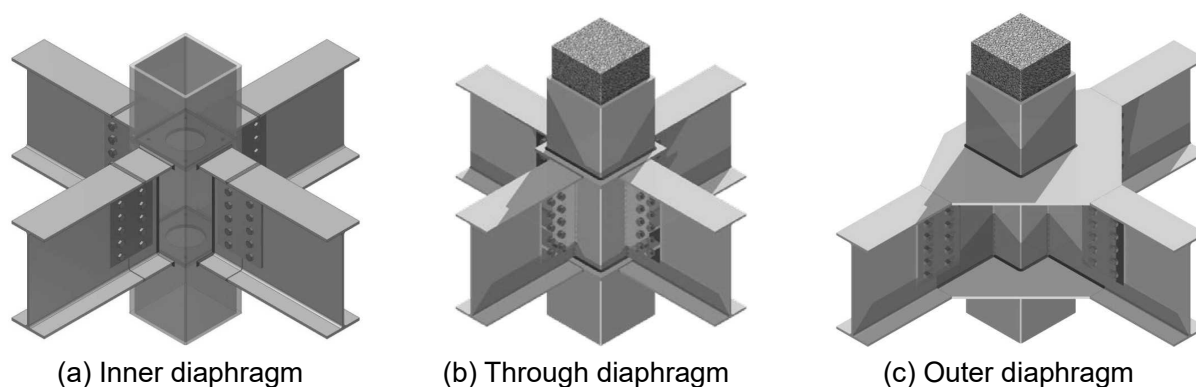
Example of diaphragm at CFT column to steel beam connection
